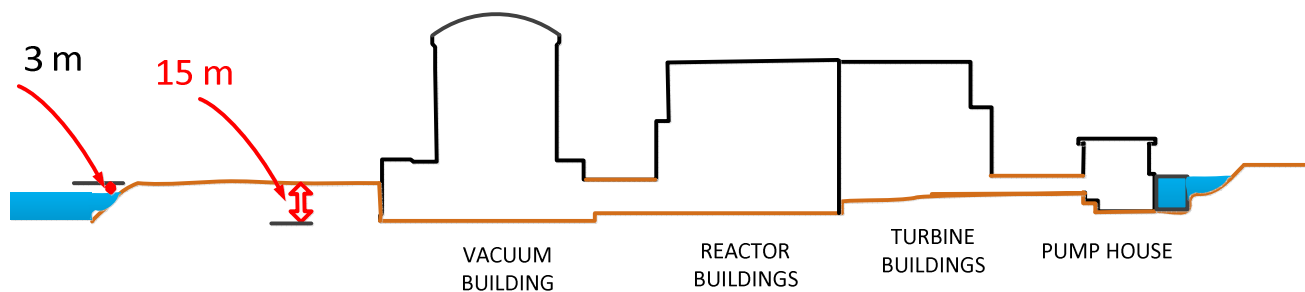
Building basement layout below Lake water level. The emergency power supply generators are at grade level with cable tunnel 6m under.
